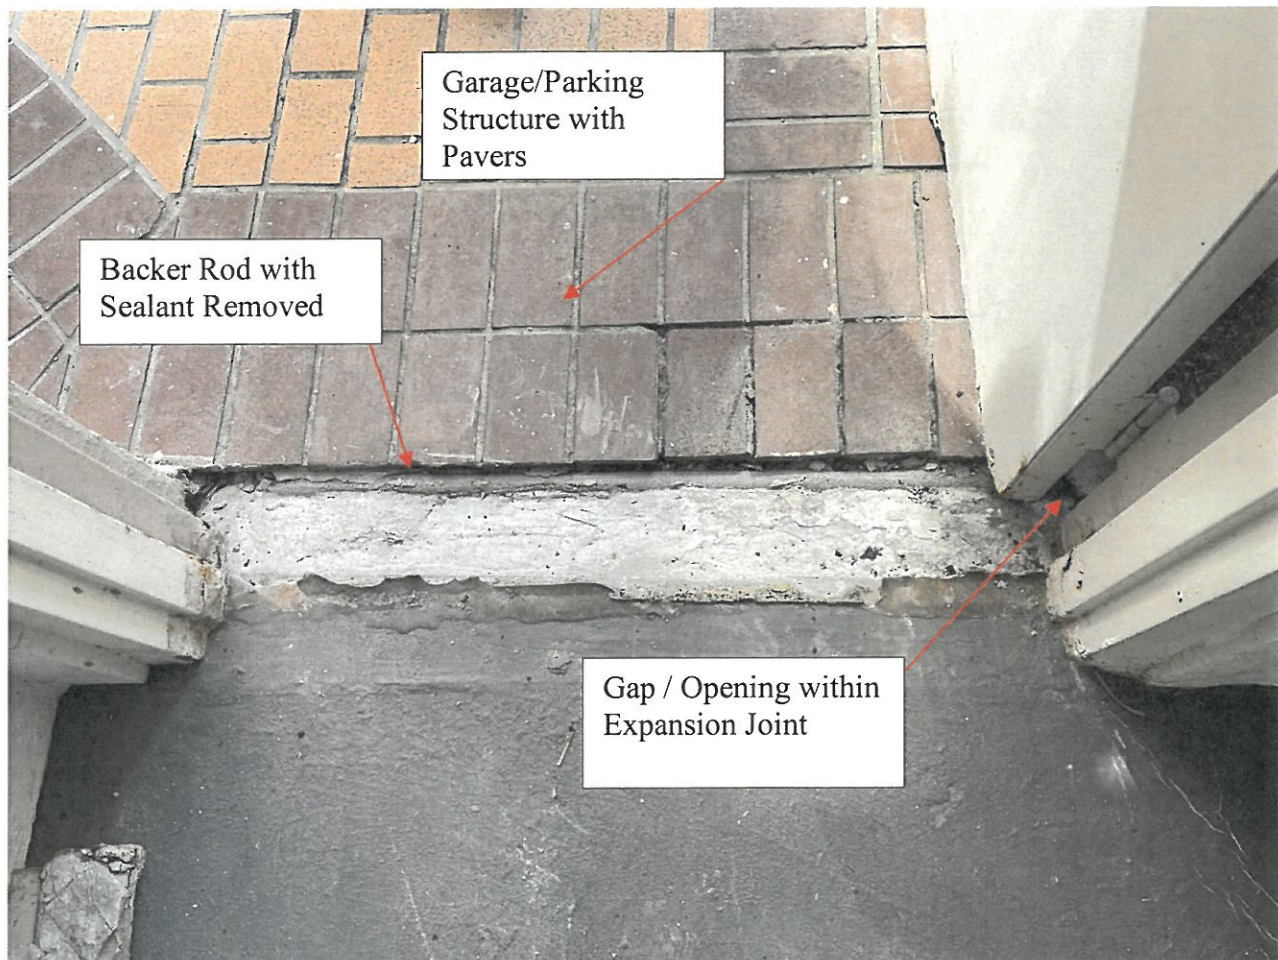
Stair Door Threshold Removed and Expansion Joint Sealant Removed (Corroded Door Frame)
